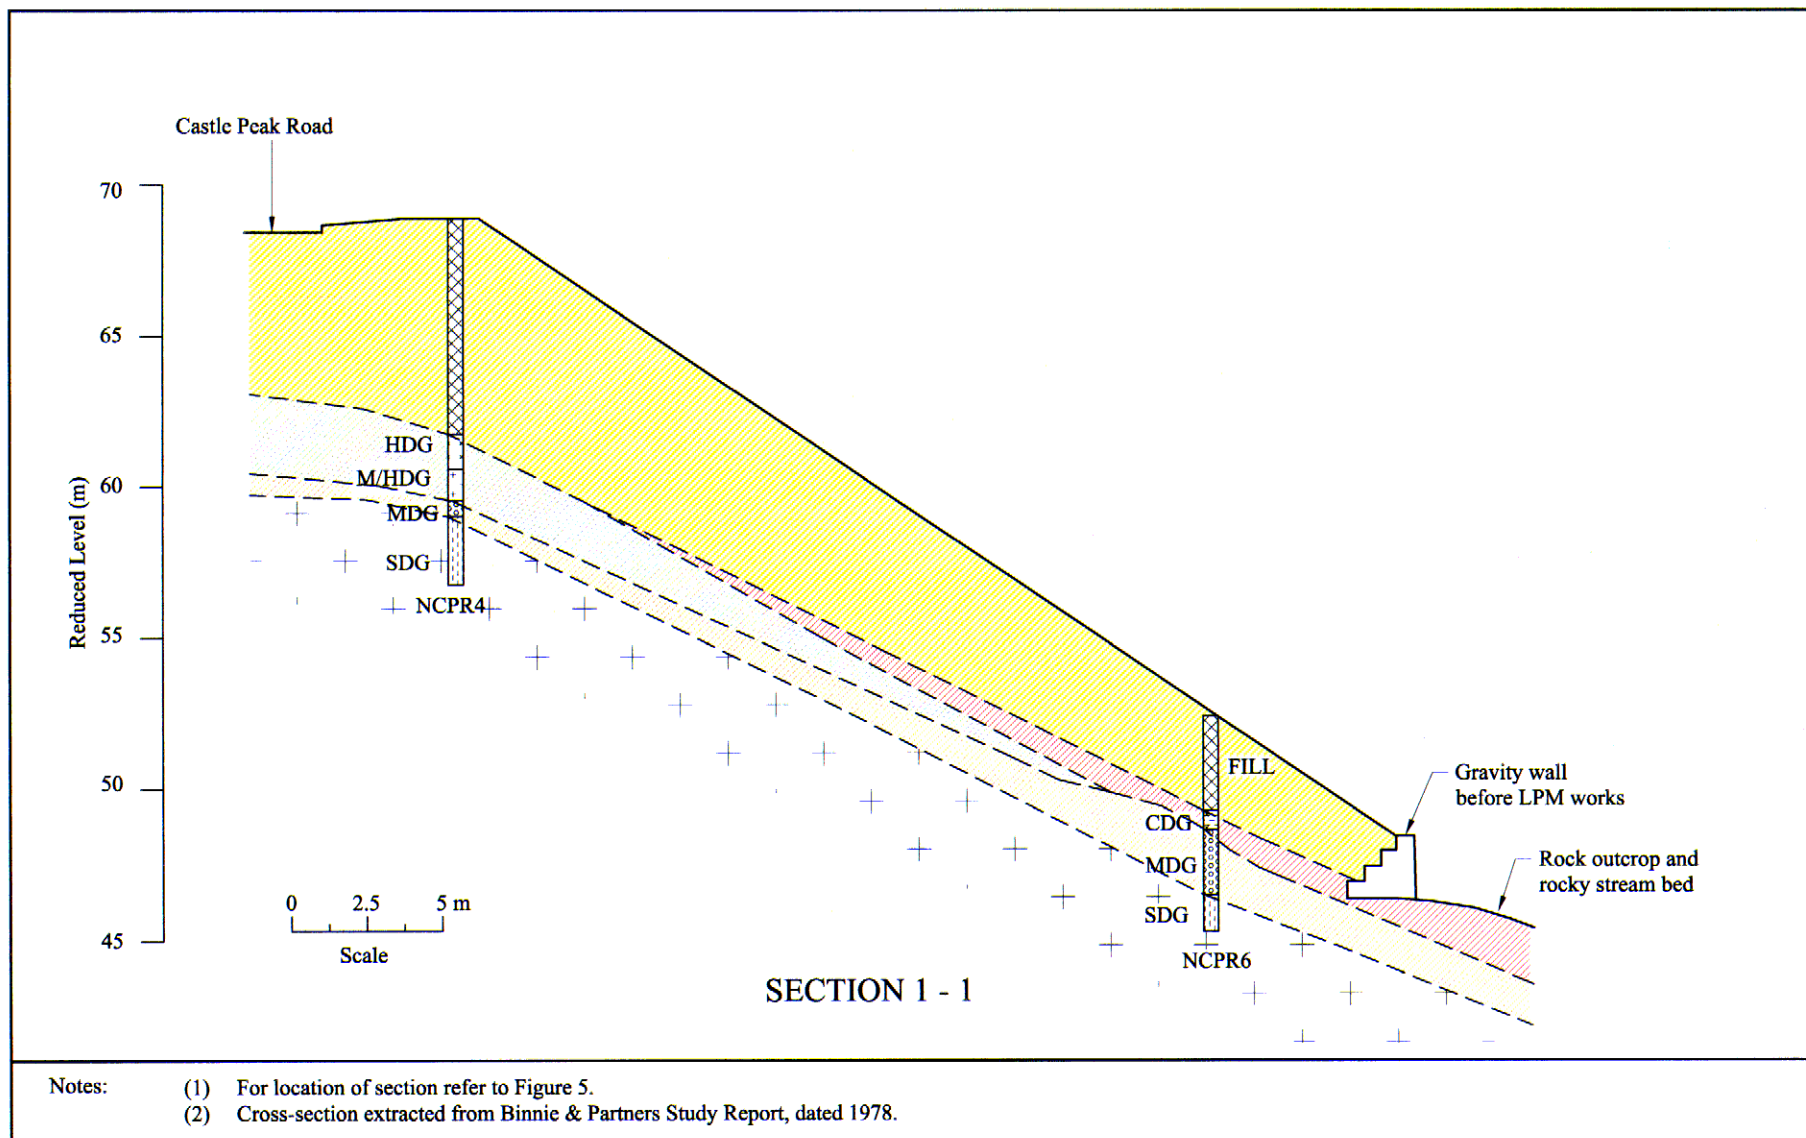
Cross-section 1 - 1 through the 1963 Fill Slope
